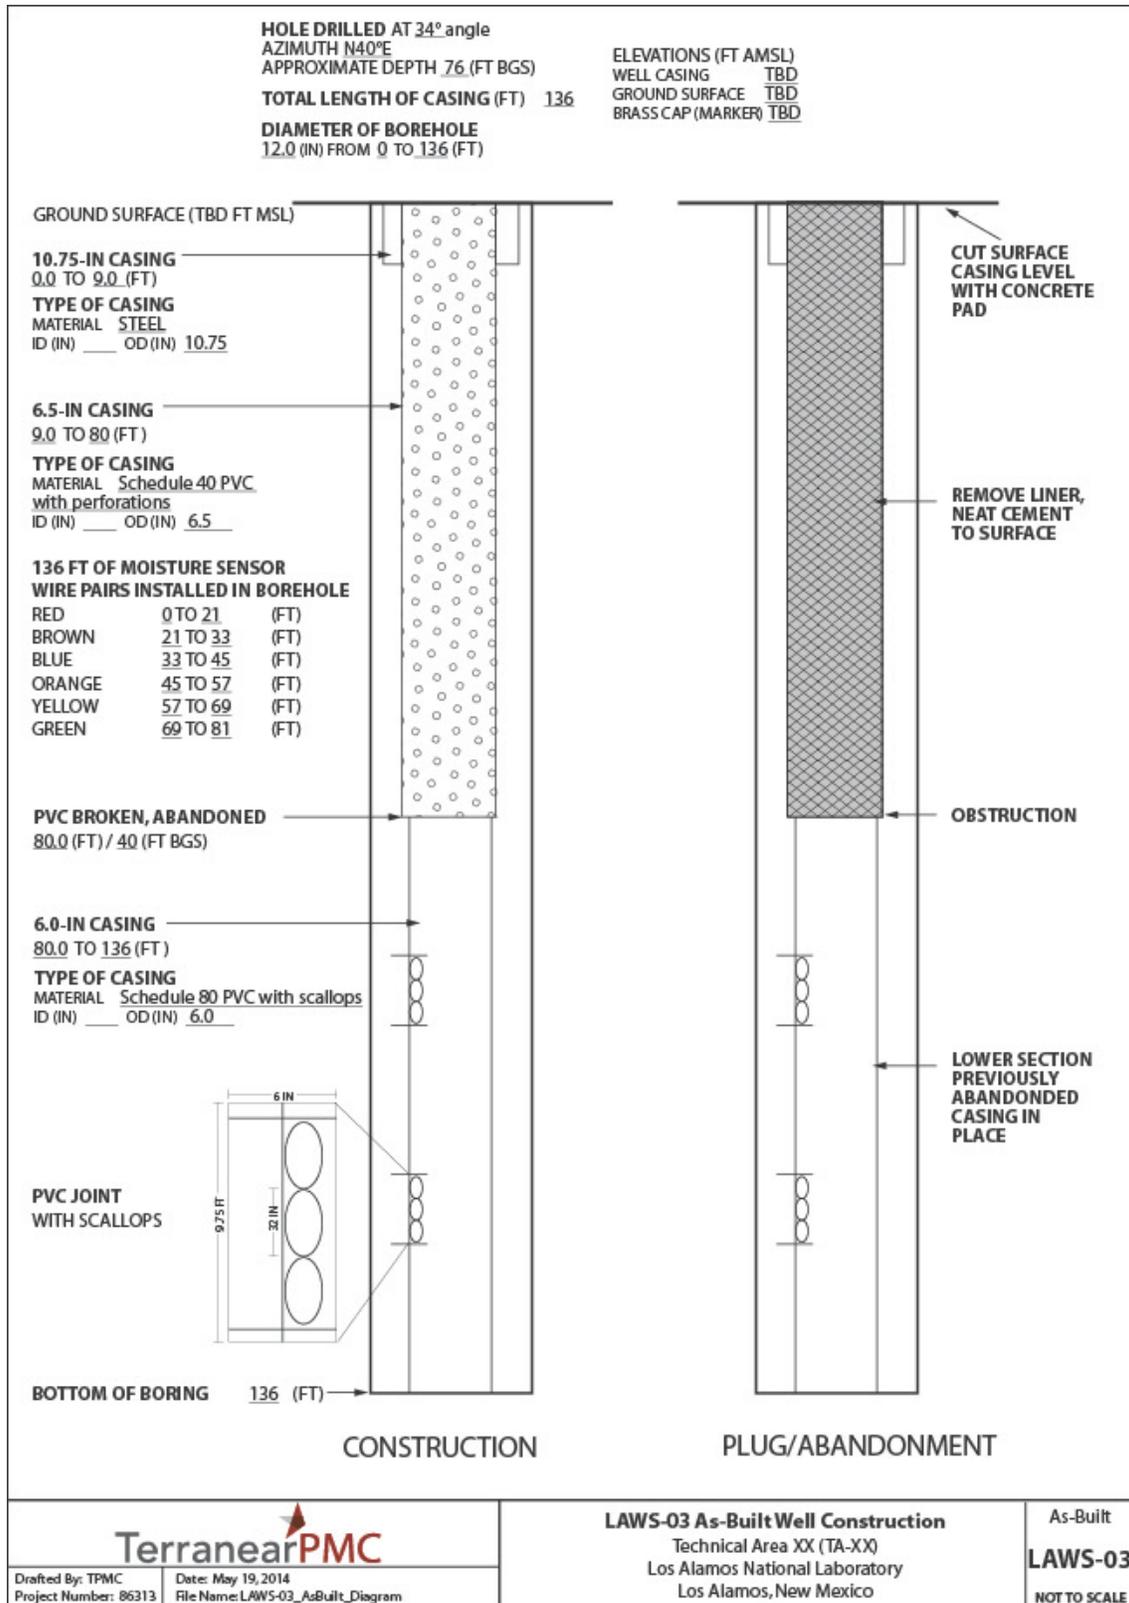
LAWS-03 Well Construction and Proposed Abandonment
